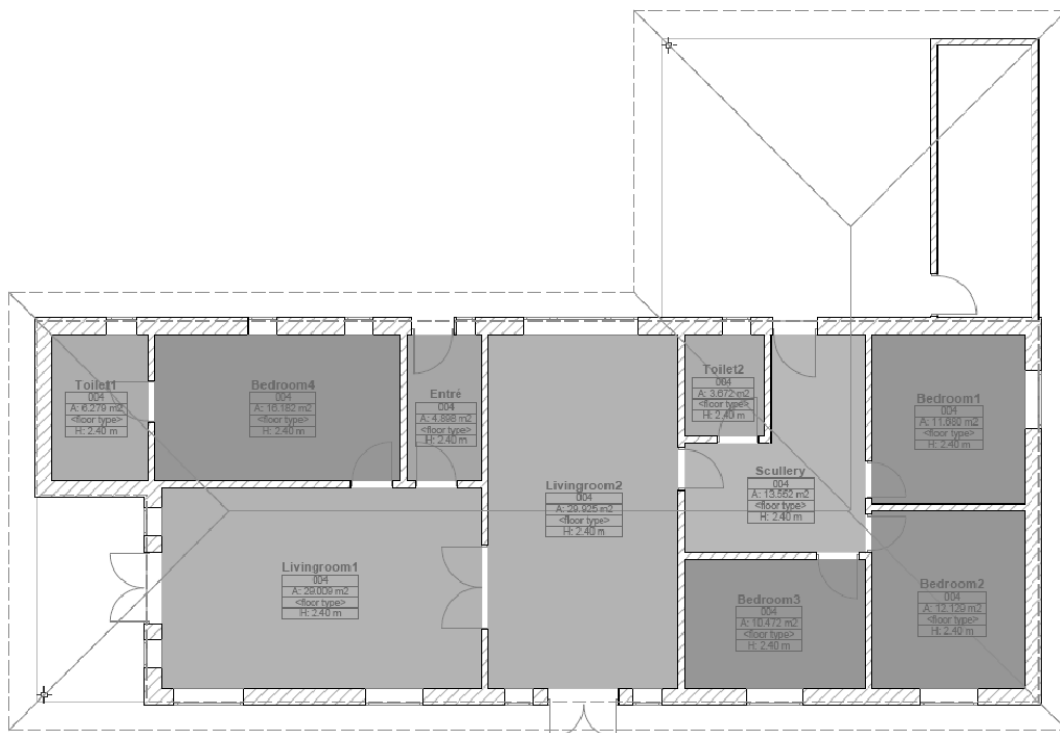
Floor plan of the reference building created from the BIM-model (Level 1.0), (not in scale)
